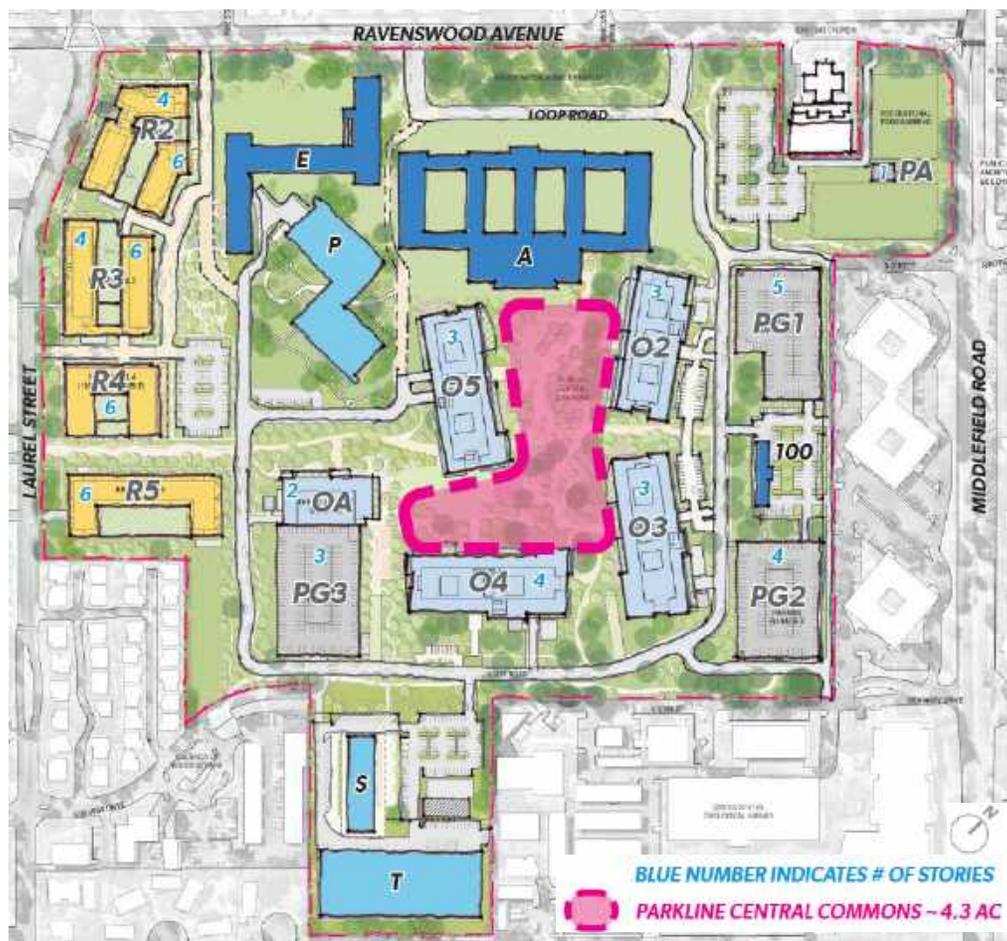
Preservation Alternative 2 site plan overlaid on Project. Source: STUDIOS Architecture, "Lane Partners Parkline: Historic Resource Evaluation – Site Plan Alternatives: Parkline Central Commons Areas," September 7, 2023. Legend edited by Page & Turnbull.
